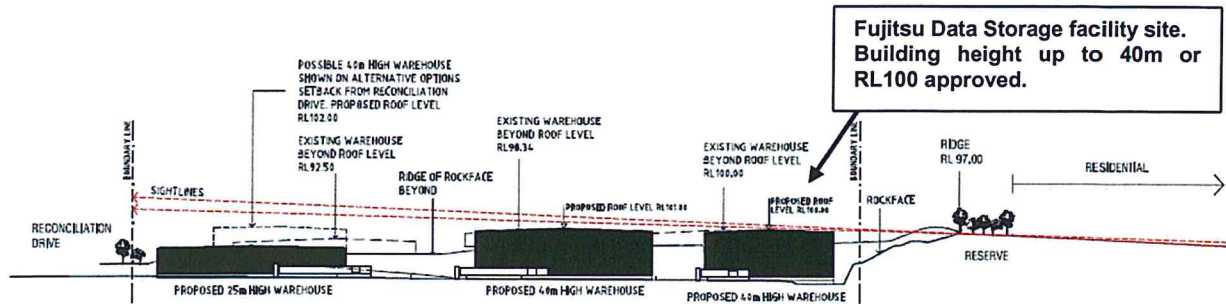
Indicative 40m high building envelope on the Fujitsu site, in relation to existing quarry walls and the rockface to the east, as approved under MP08_0259.
